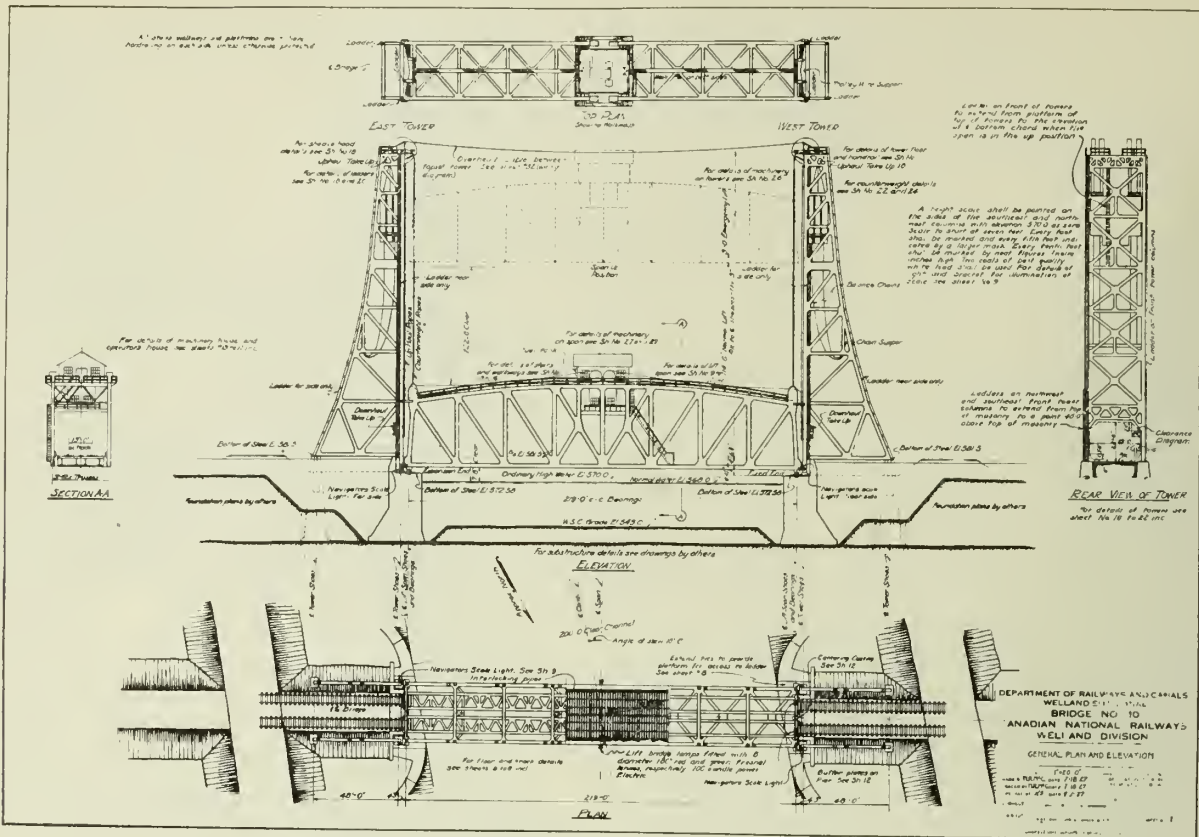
Bridge No. 10—General Plan and Elevation.
